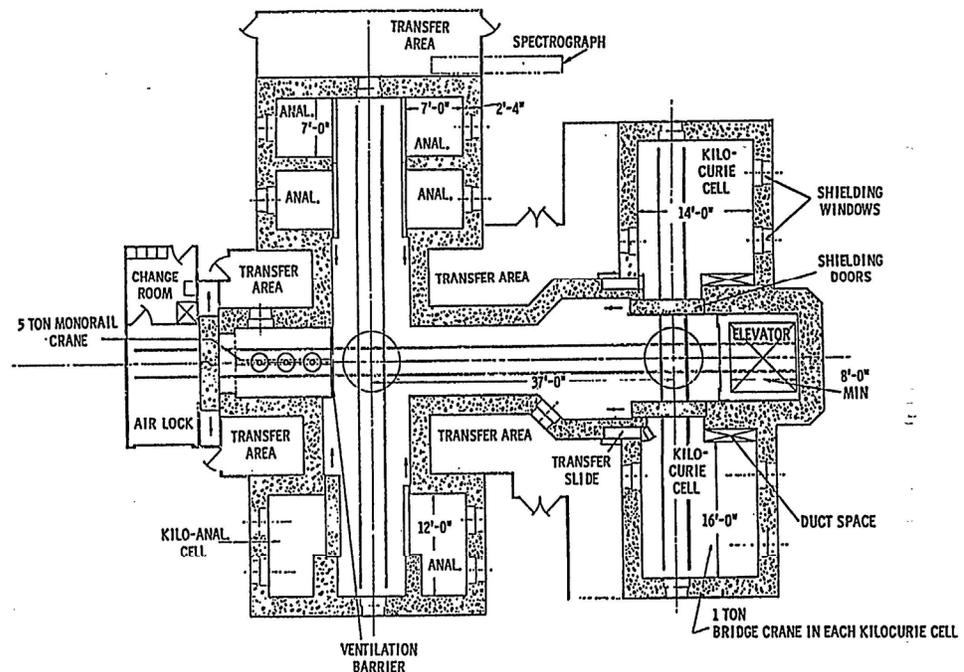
Plan View of Building 200 Main Floor Showing Location of the Kilocurie Hot Cells
